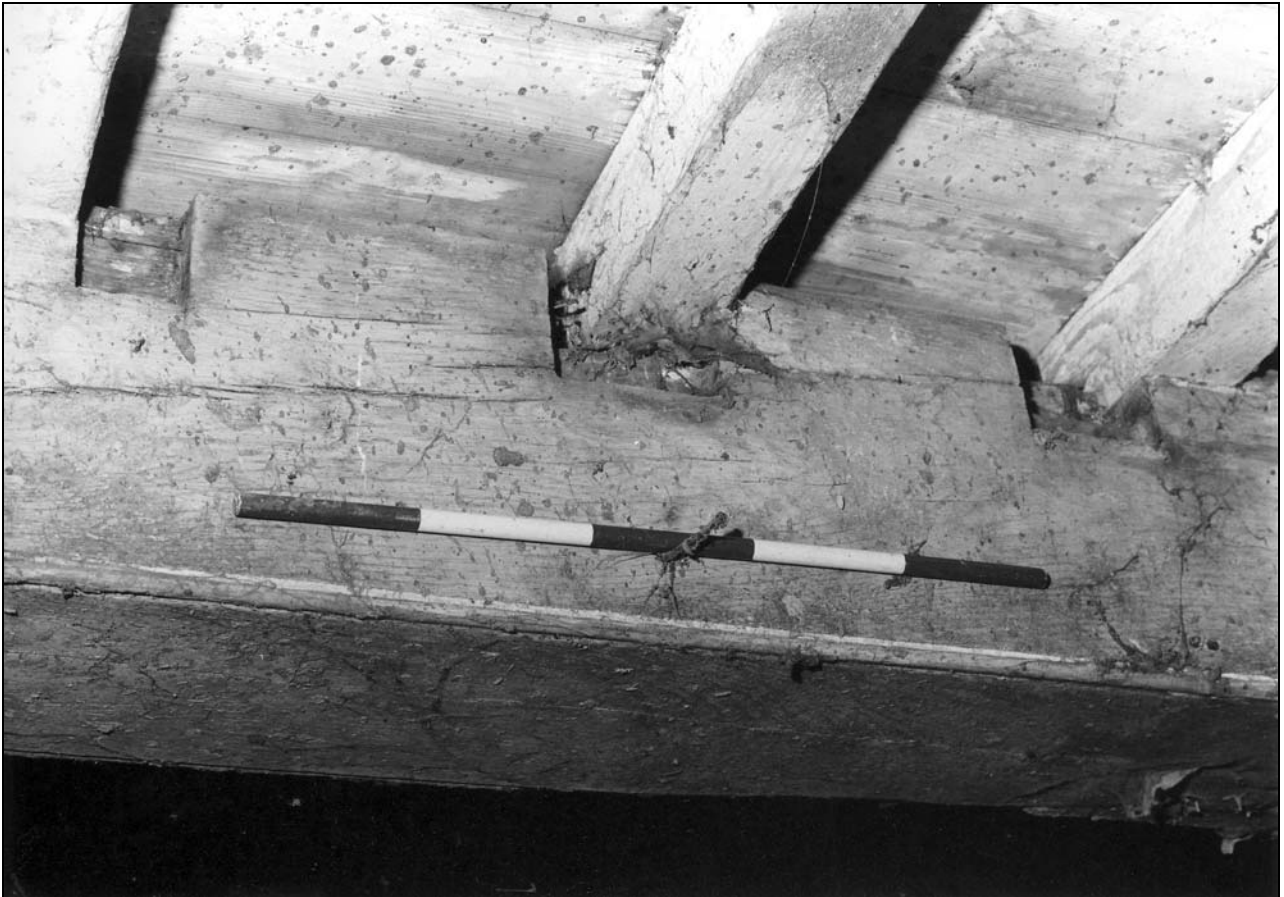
Building 2: detail of re-used, moulded ceiling beam, on ground floor (film 2, frame 14)
